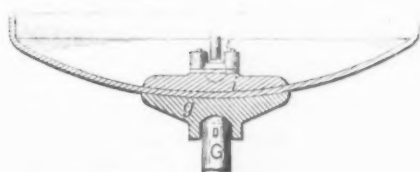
Method of Clamping a Dished Flanged Lead.
